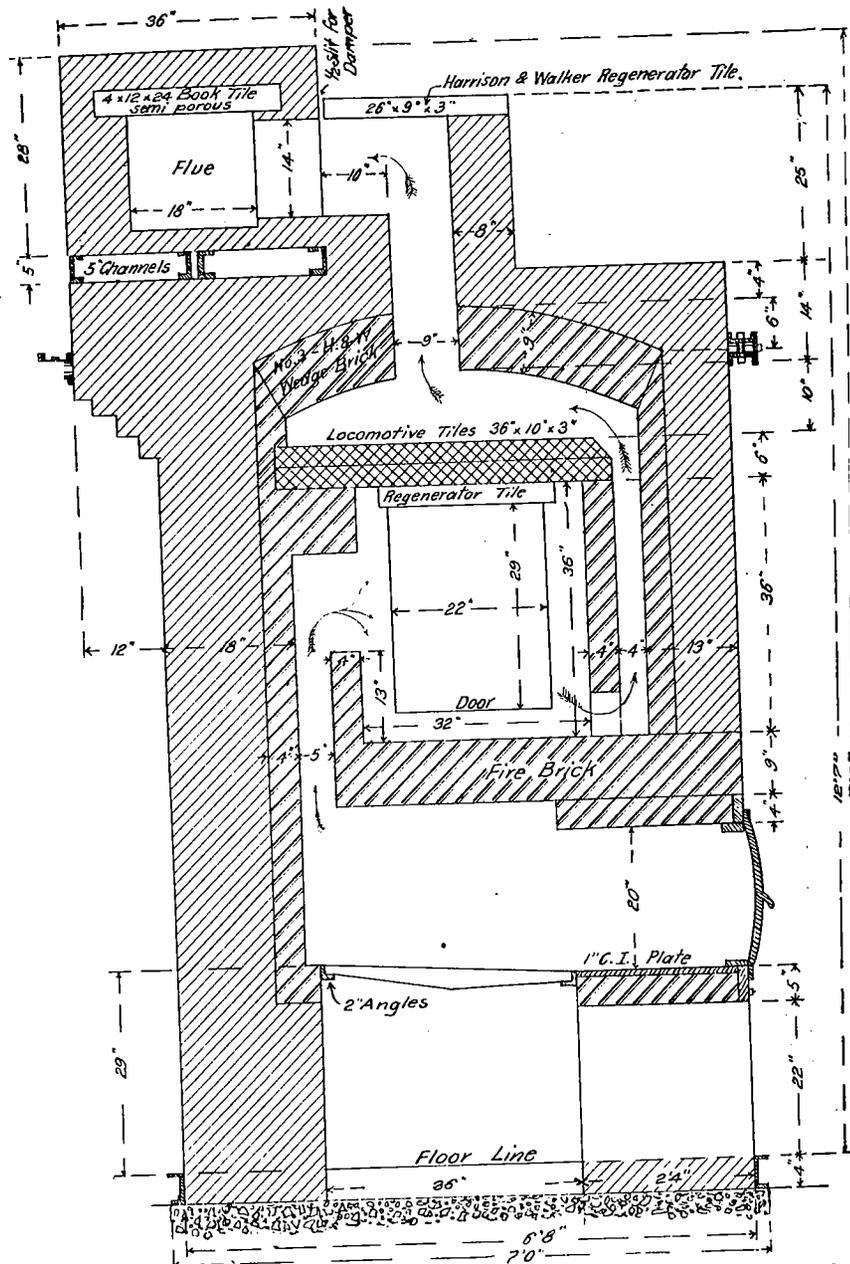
Cross section of test kiln in clay testing laboratory of the United States Bureau of Standards at Pittsburgh.
